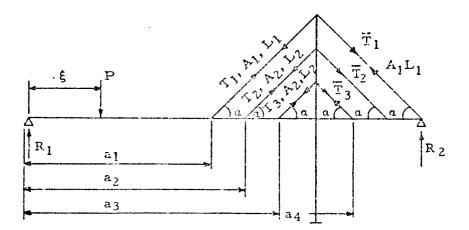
STAYED GIRDER BRIDGE, ELEVATION VIEW
